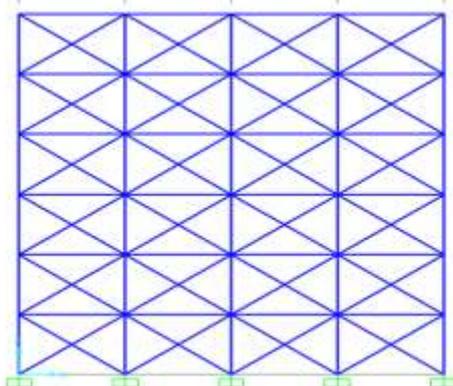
Building with bracings provided at outer periphery Section ISMB 200
